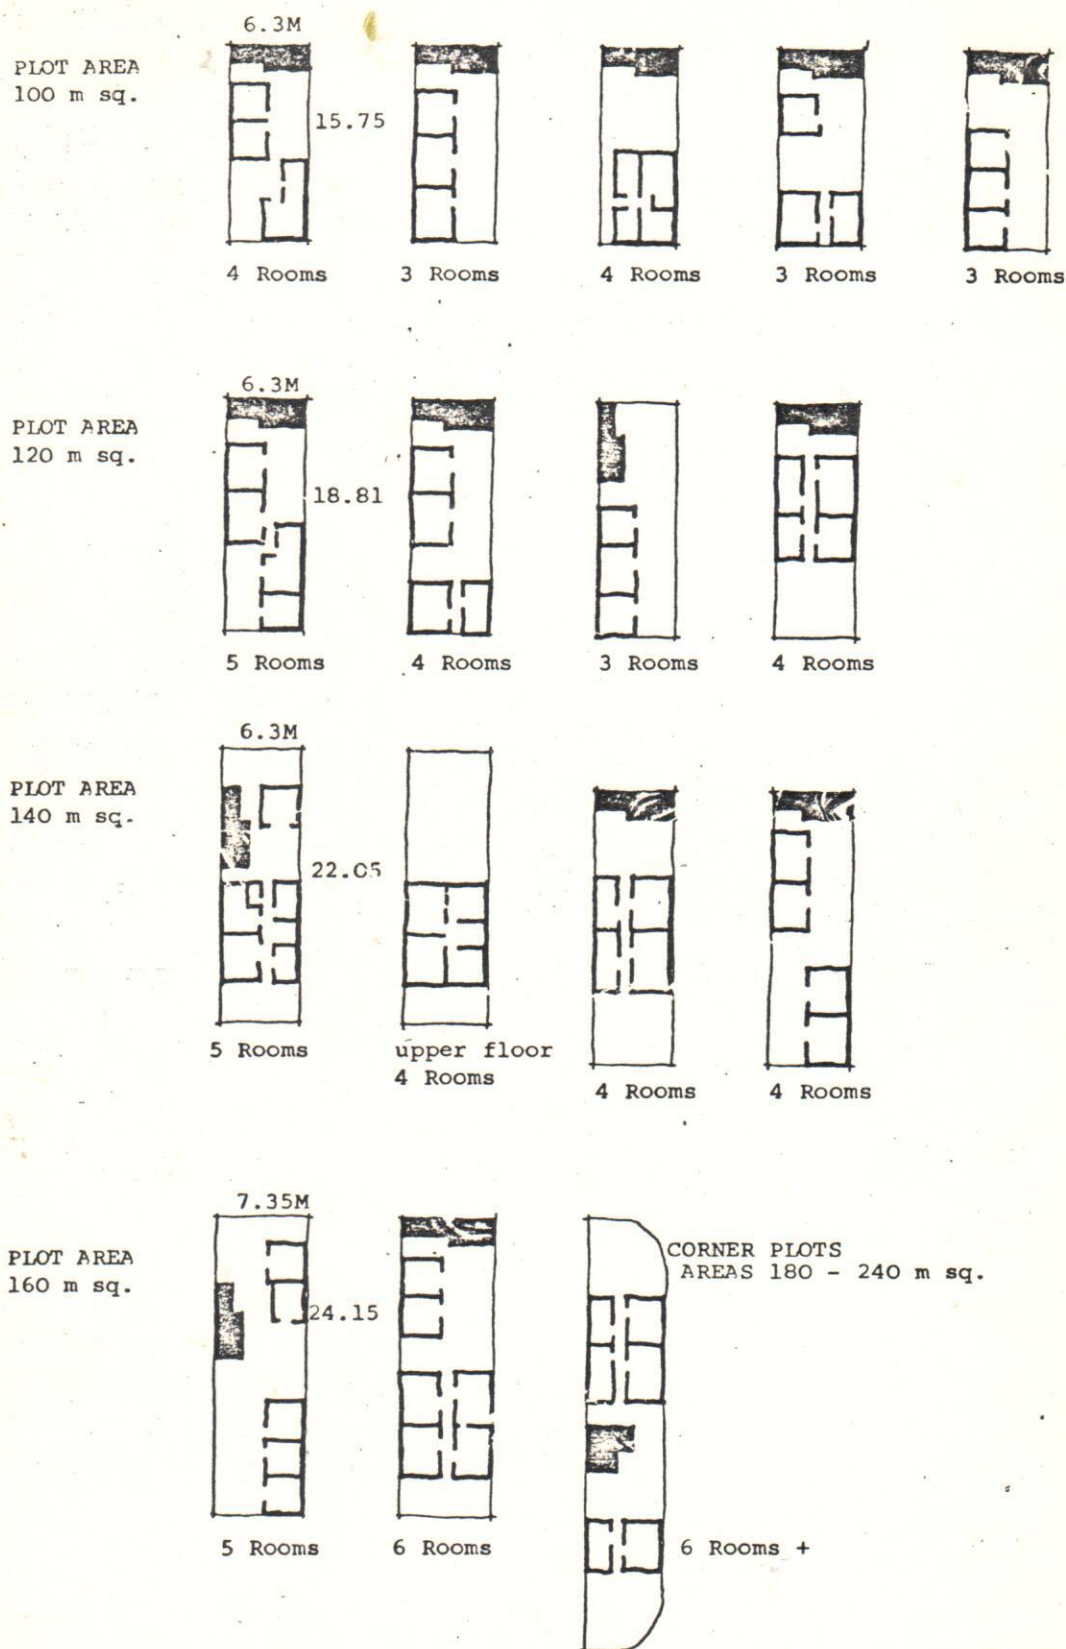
TYPICAL HOUSE PLANS PREPARED BY THE TECHNICAL SECTION
